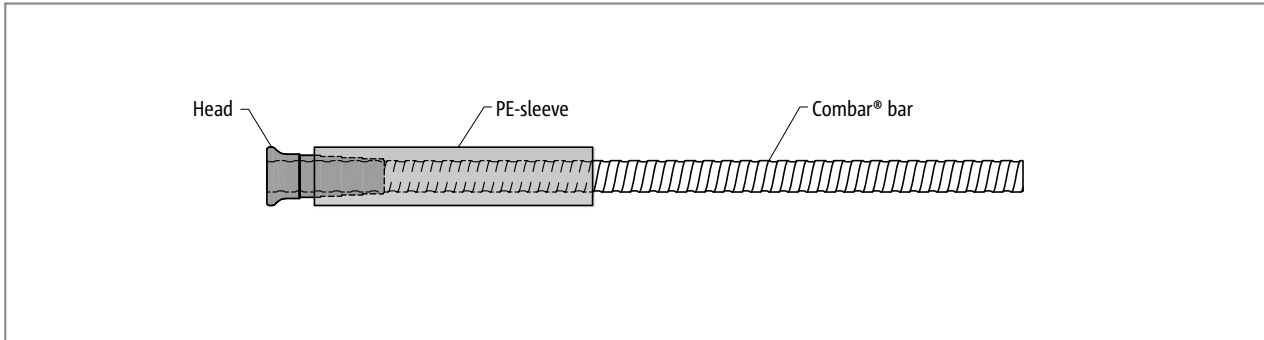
Schöck Combar® FT erection support: Combar® single-headed bar with sleeve
